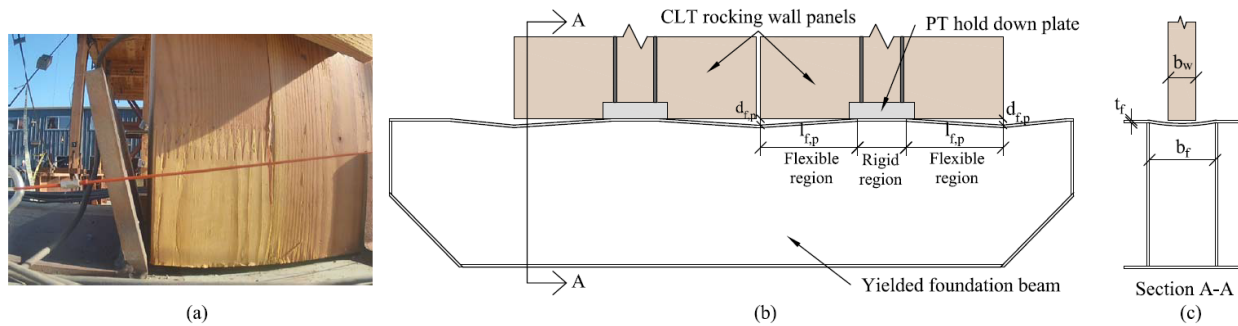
Wall base and foundation beam, (a) photo of gap at base of the wall panel and the foundation beam at the end of testing, (b) yielded foundation beam schematic plan view, and (c) cross section view.
